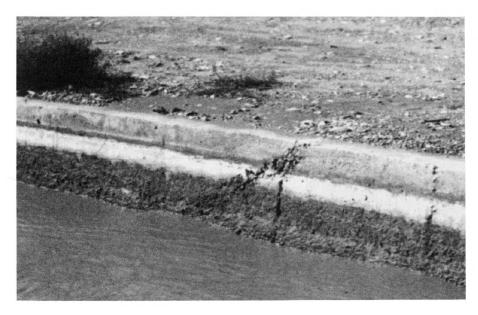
Cracks in the concrete lining of the Shinob Kibe canal.
